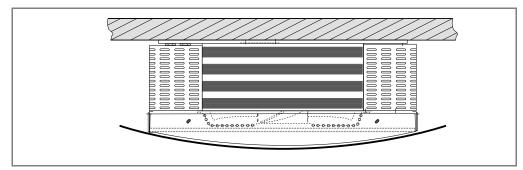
Ceiling mounting of Multi Flair unit heaters
